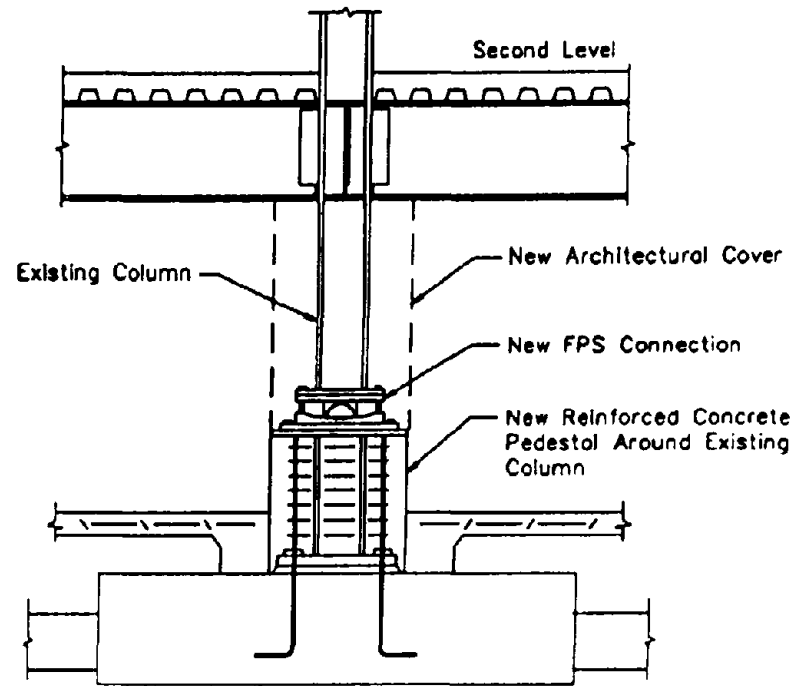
Using FPS to retrofit an existing concrete moment frame building
